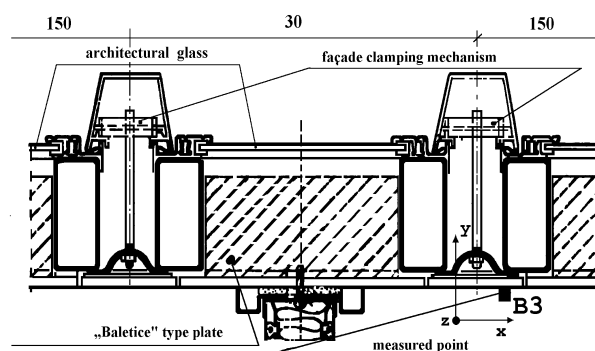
Façade wall cross-section and location of measurement point B<sub>3</sub>.
